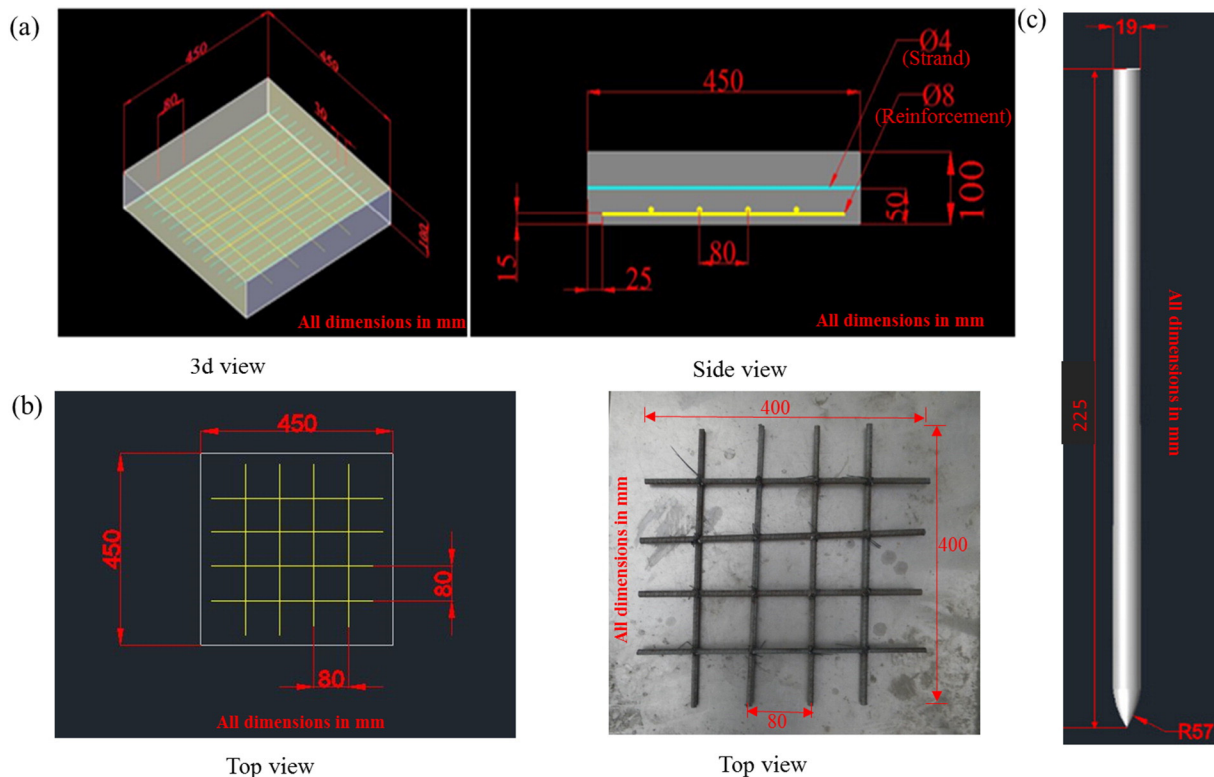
Schematic of (a) prestressed concrete target (b) detail of reinforcement (c) projectile.
